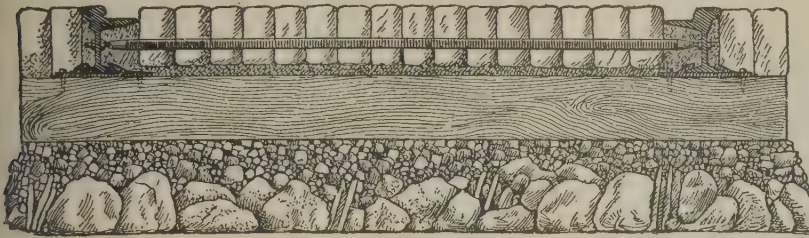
CROSS SECTION OF TRACK ON BALLAST FOUNDATION—GIRDER RAIL SPIKED TO TIES.
